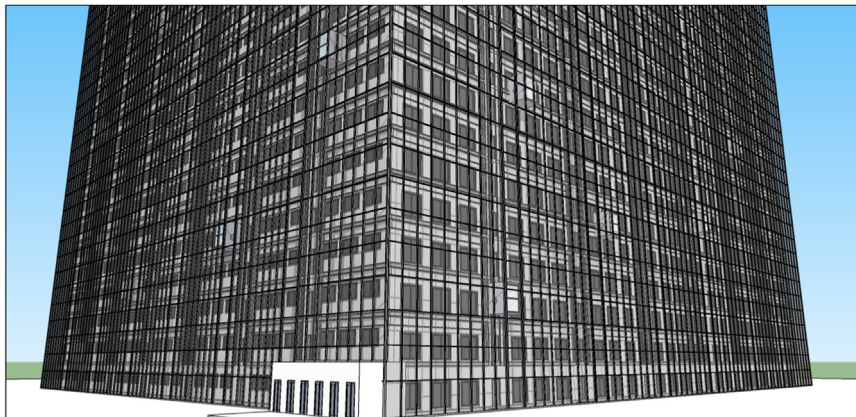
General overview of the steel framework installed on the building façade (the white block shows the main terminal where passengers board the cars).
